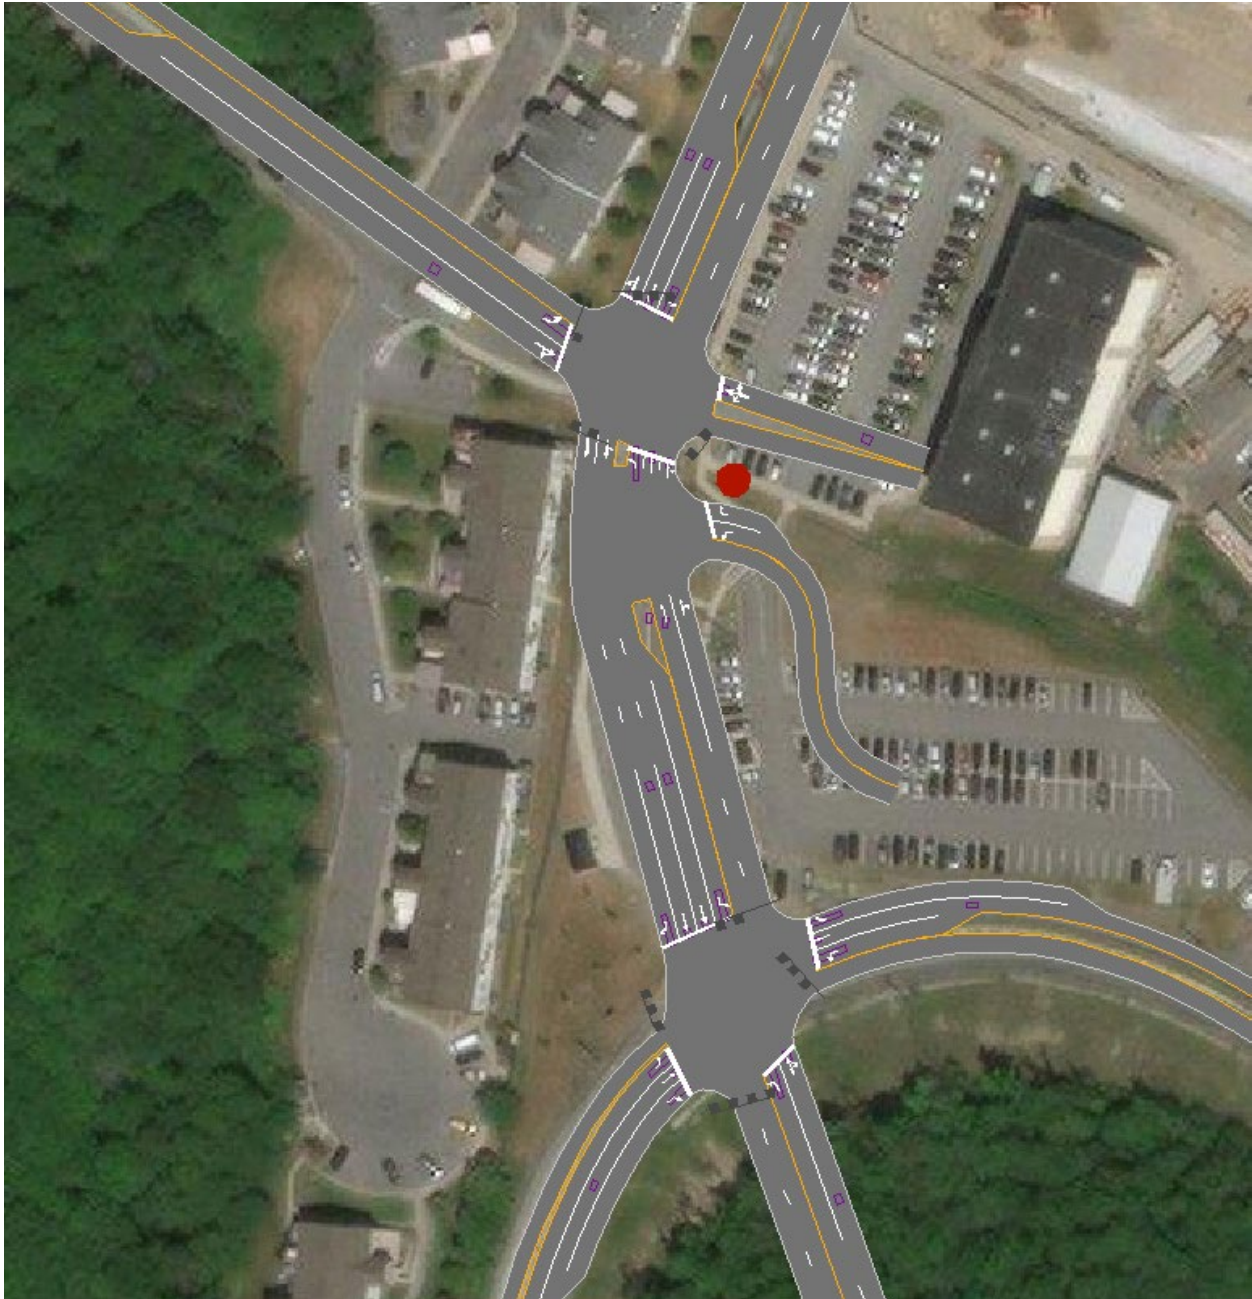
Bakertown Road/Meron Drive/CR105 Intersection Alternative
